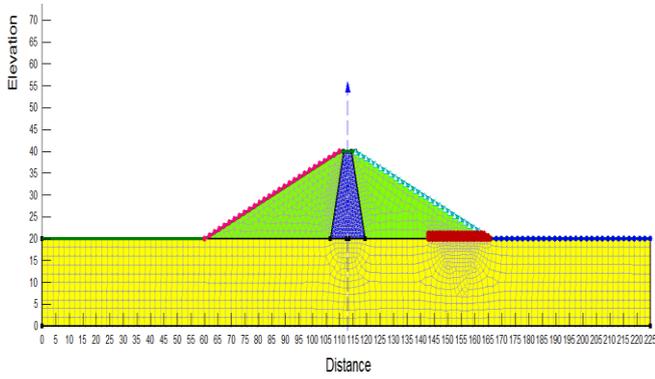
Cross section of earth dam with horizontal drain length of 25.23 meters from the toe of the dam
